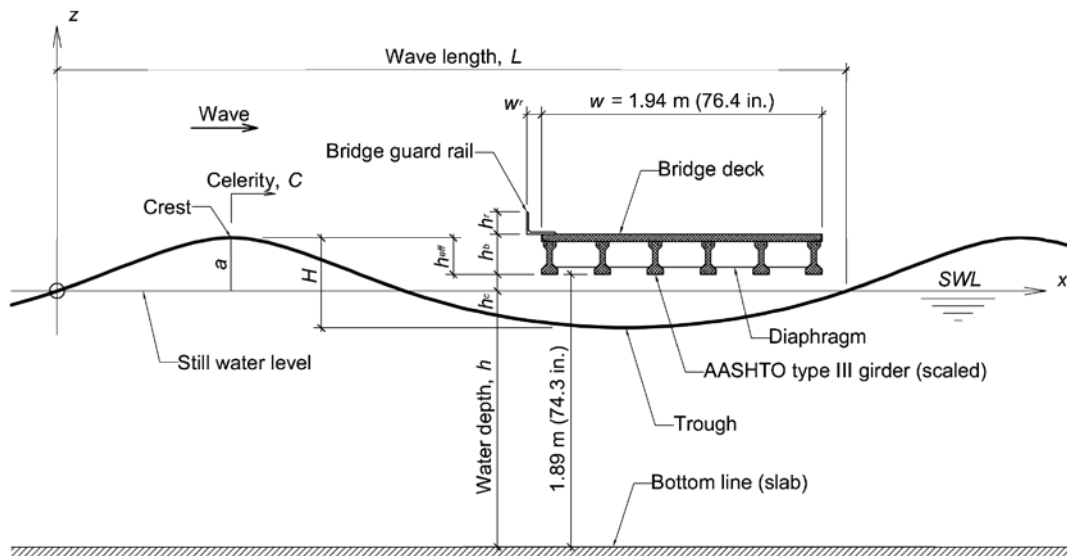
ELEVATION VIEW OF THE TEST SPECIMEN ACROSS TANK WITH TEST VARIABLES.
